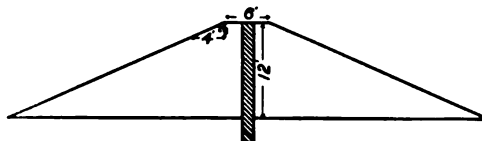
Cross-section of an earth dam showing core wall. A loose stone dam would have the same cross-section but would not have the core wall.
